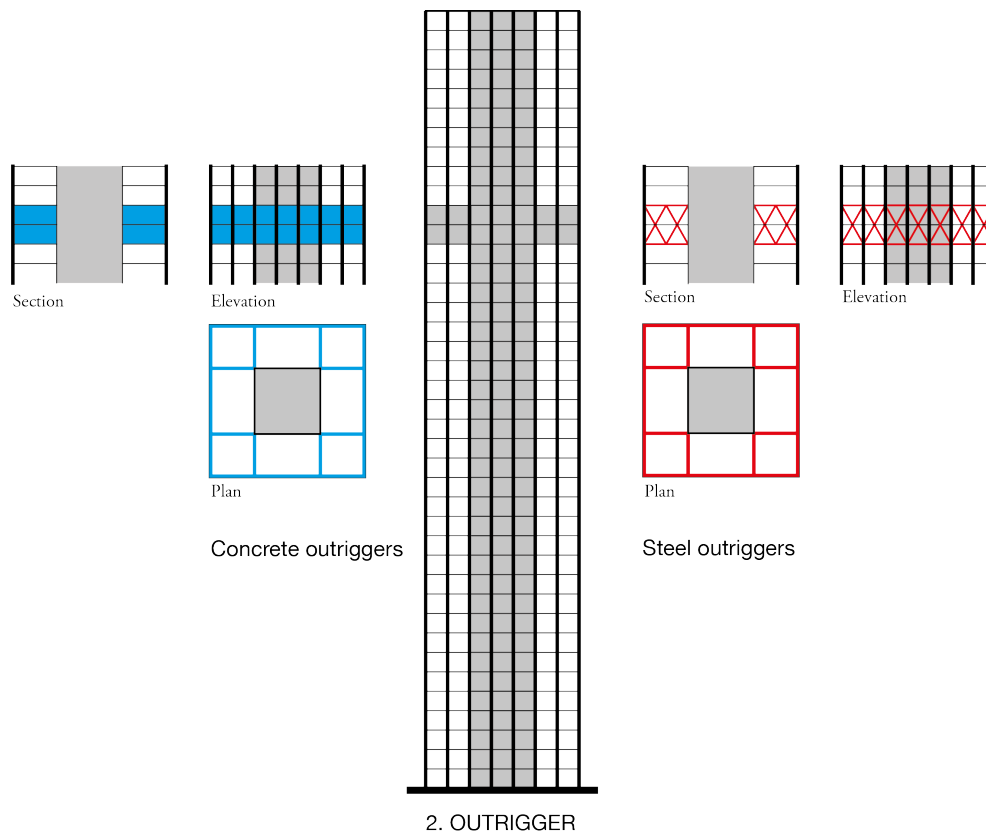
Elevation view of the outrigger model with shear walls. At the right side the outriggers and belt-truss for concrete (blue) and steel (red).
